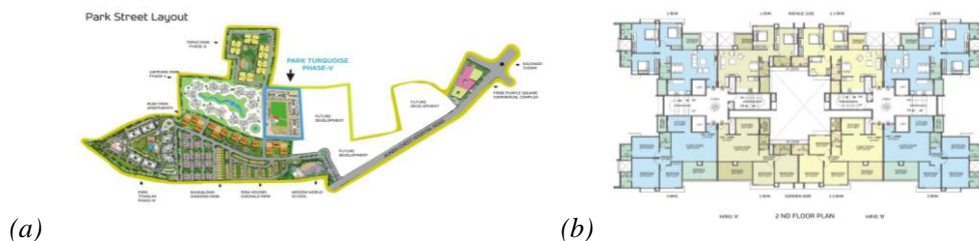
(a) Layout of Live Case Study (b) Typical Floor Plan of the Building.
